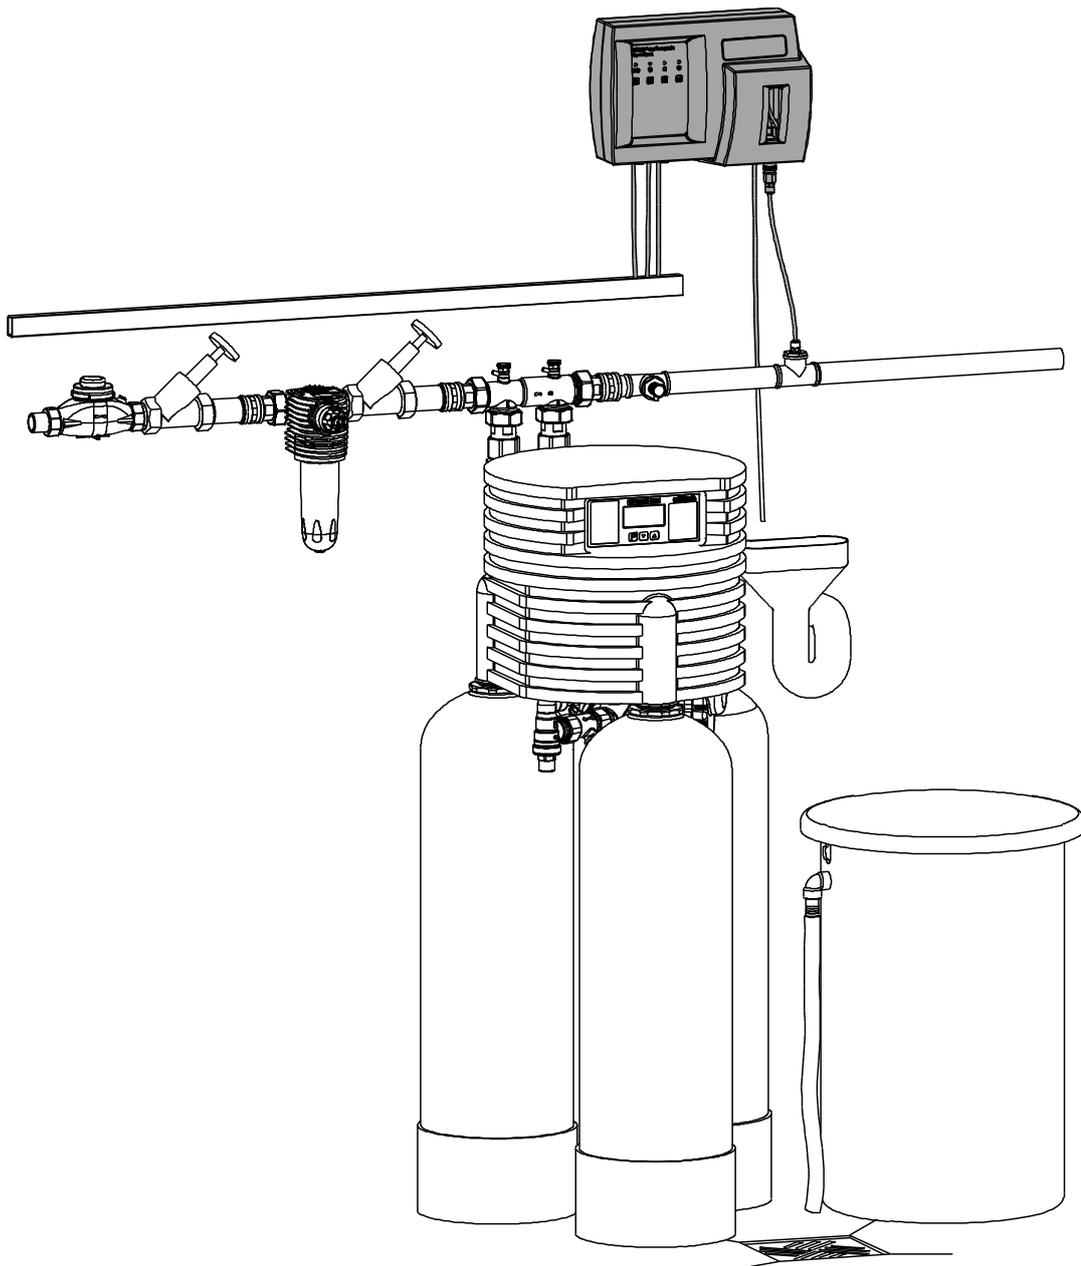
Installation drawing of GENO-softwatch Komfort
